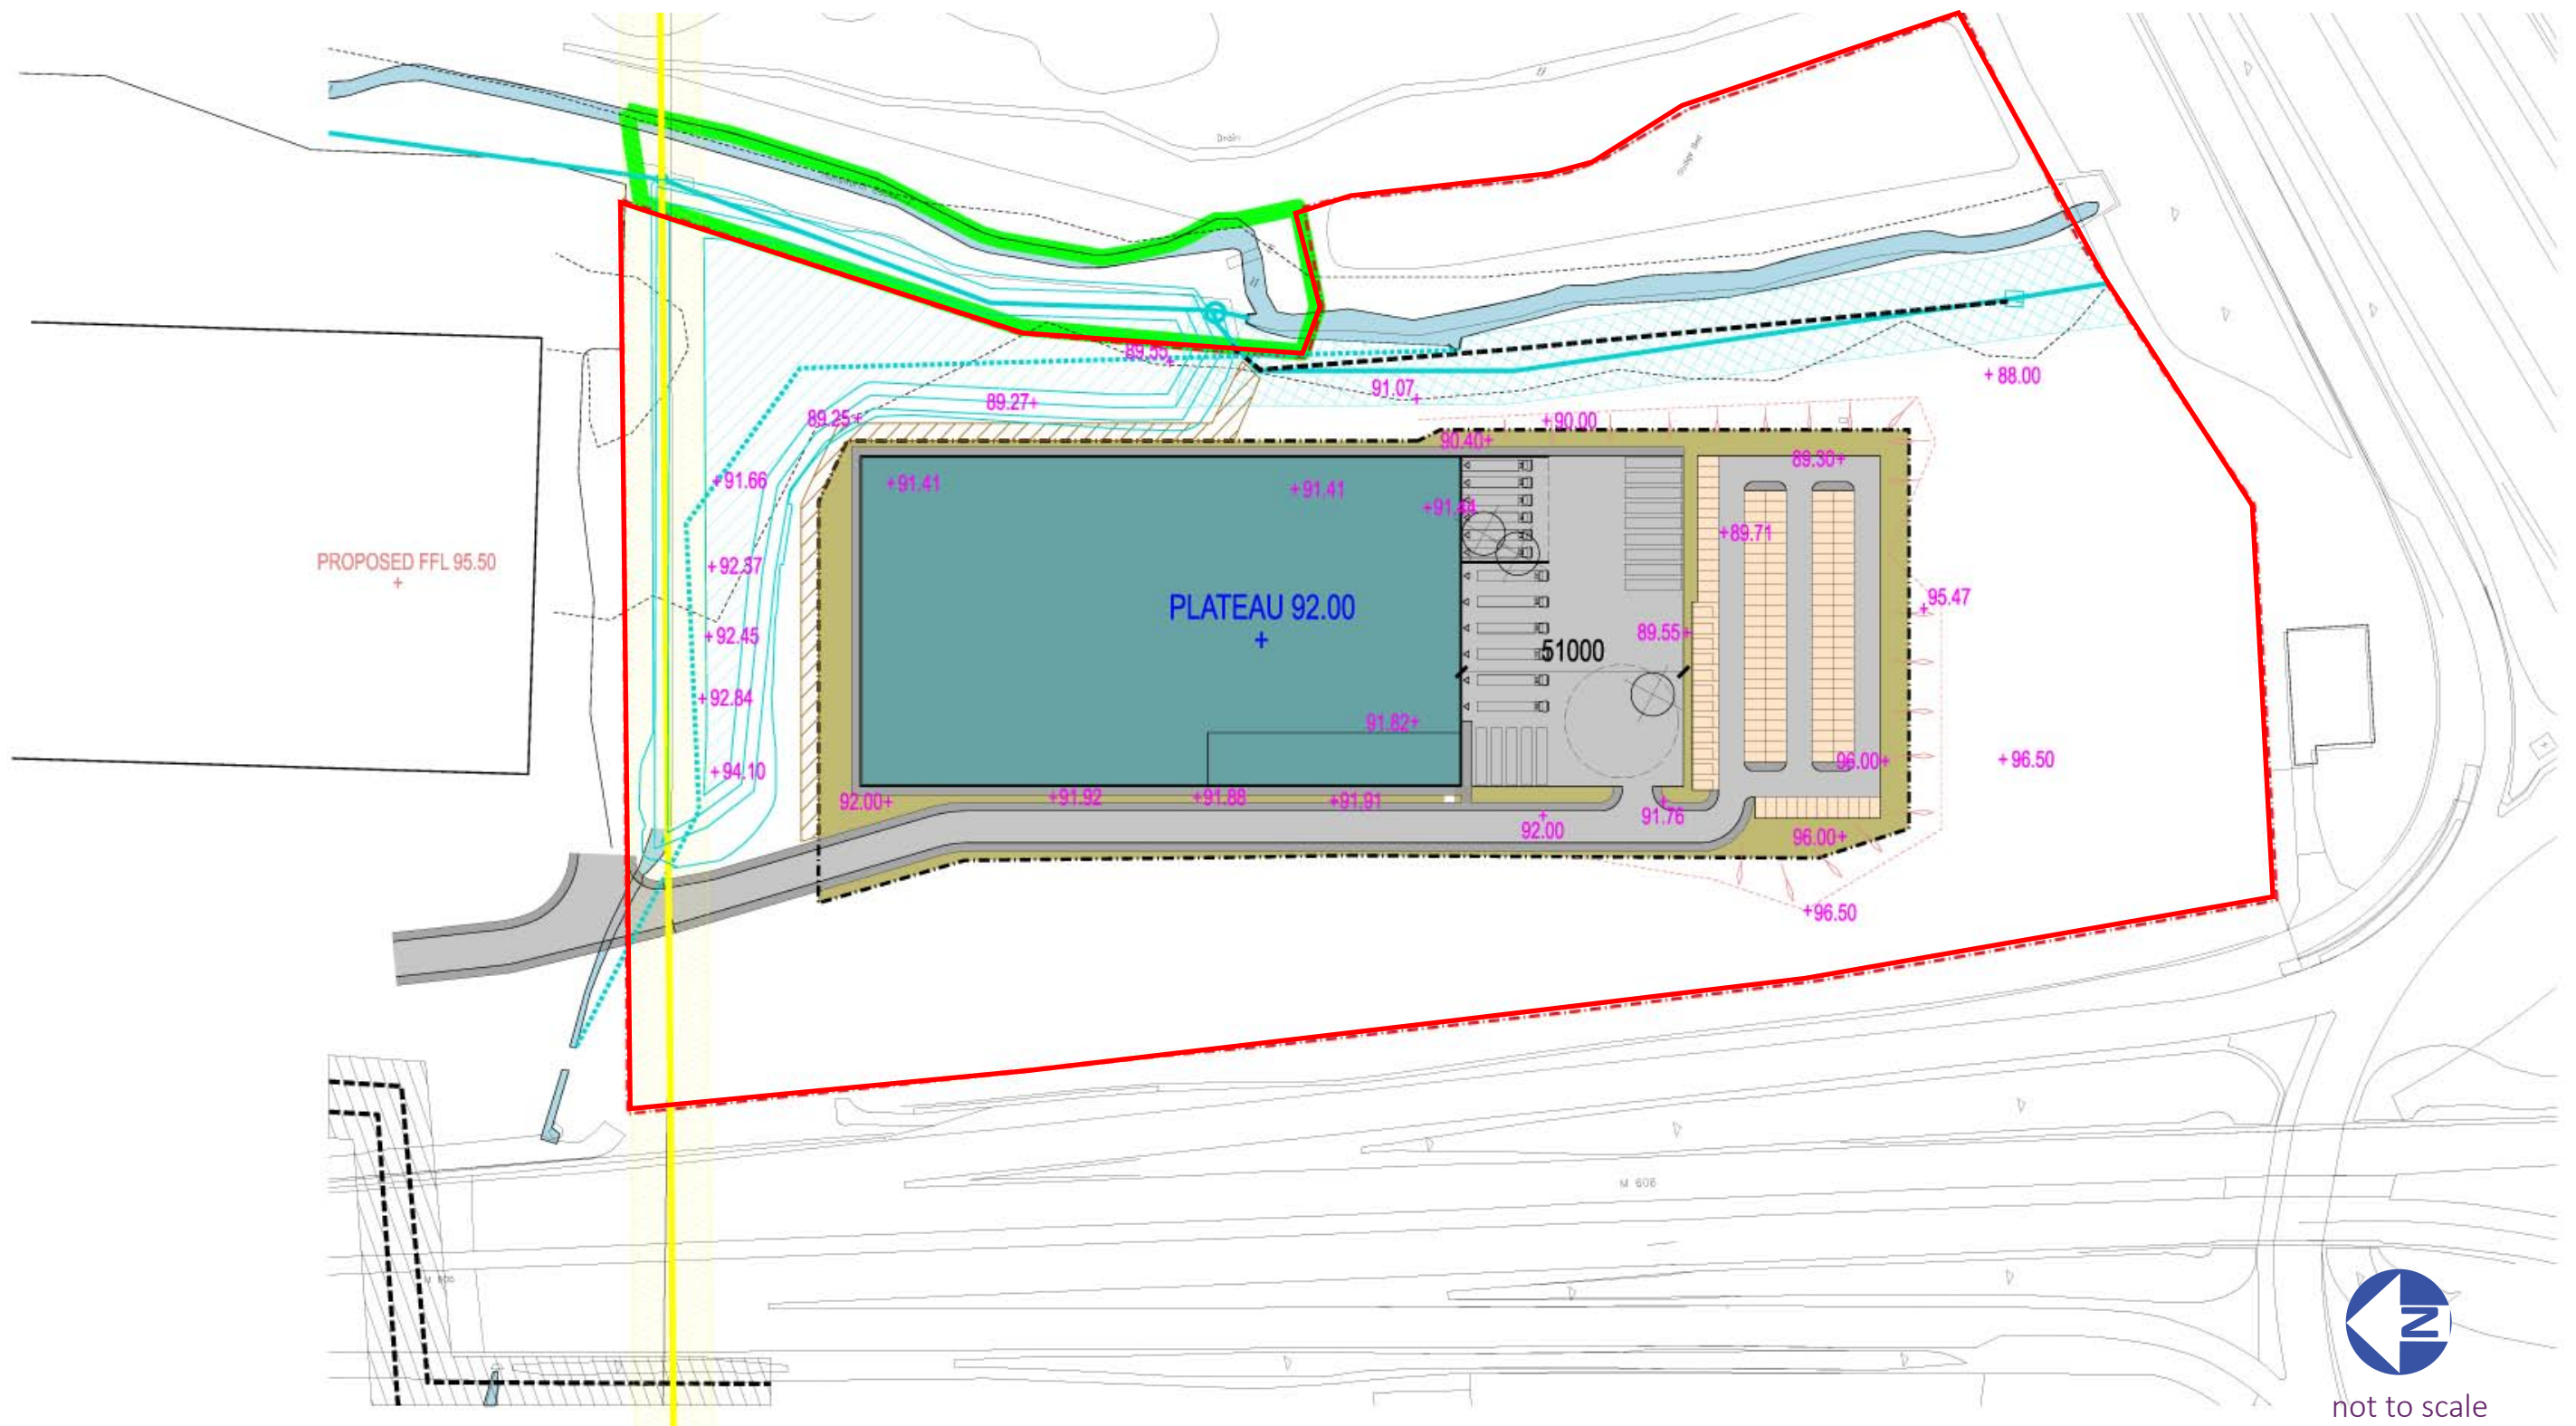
Above: Extract of Design Proposals prepared by KPP Architects (drawing Ref: 1773-01 Rev B)
